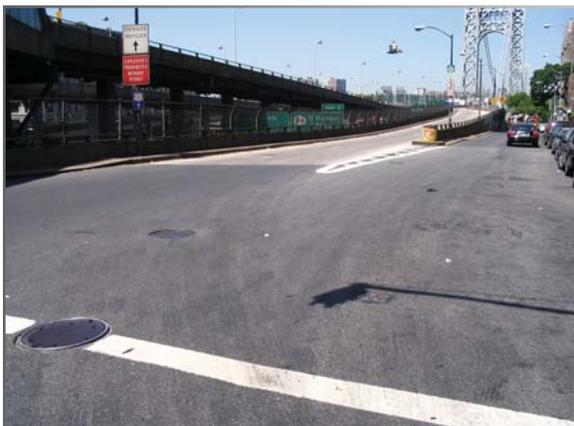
Looking west at the striped median dividing the on-ramp from West 179th Street.
